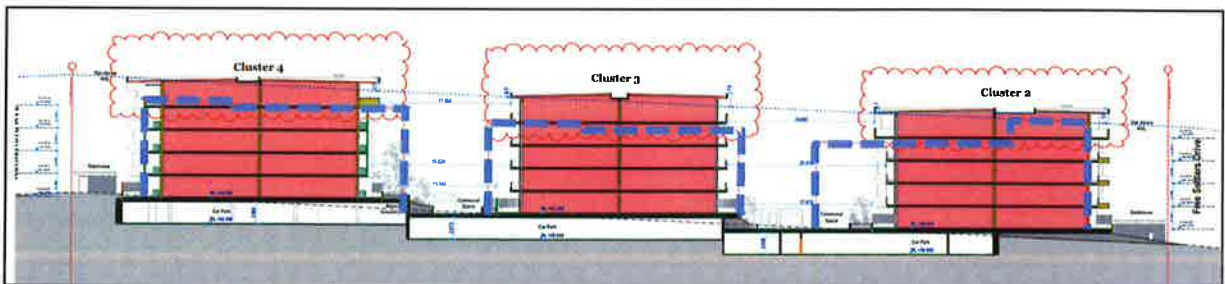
Section through the site with approved building envelopes outlined, indicating change in building height and location (base image source: Mod 7 application documents)
